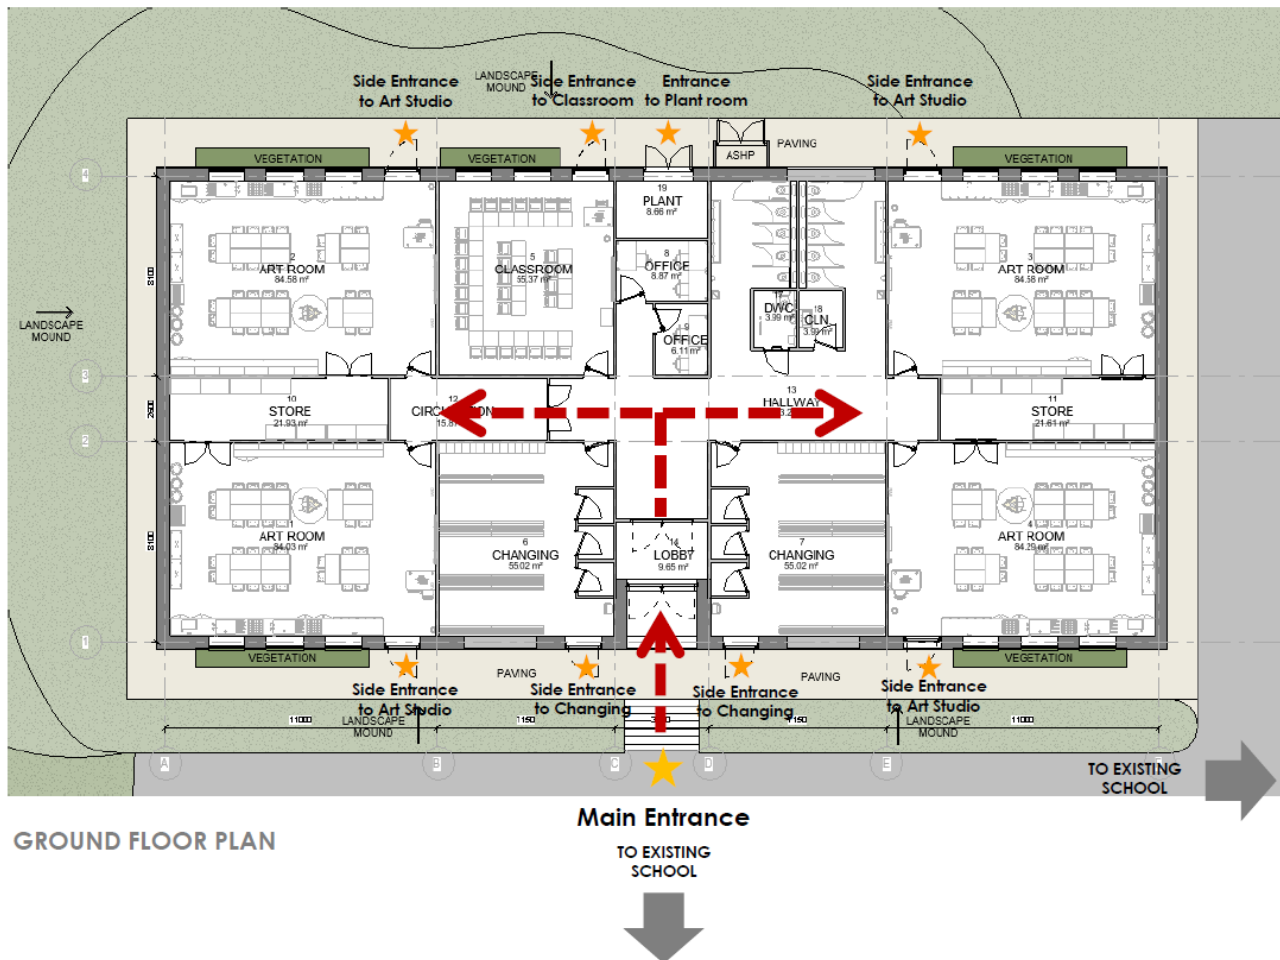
Proposed Art Block, Ground Floor Plan. Taken from CPMG Design and Access Statement
